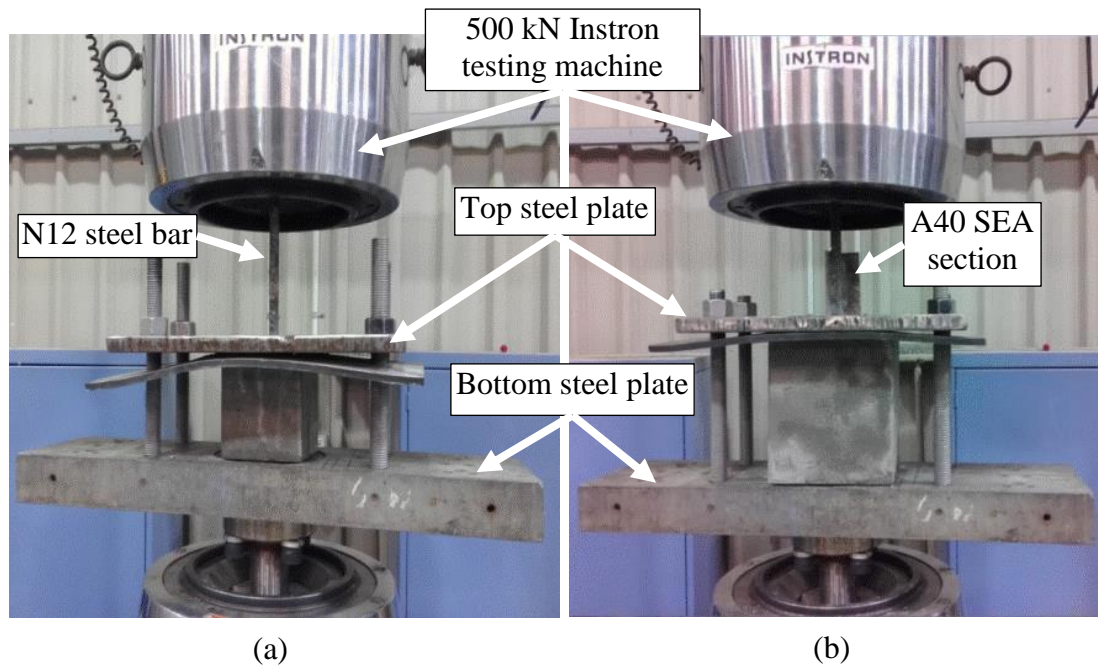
Typical pullout test set up: (a) N12 steel bar pullout specimens and (b) A40 SEA pullout specimen
